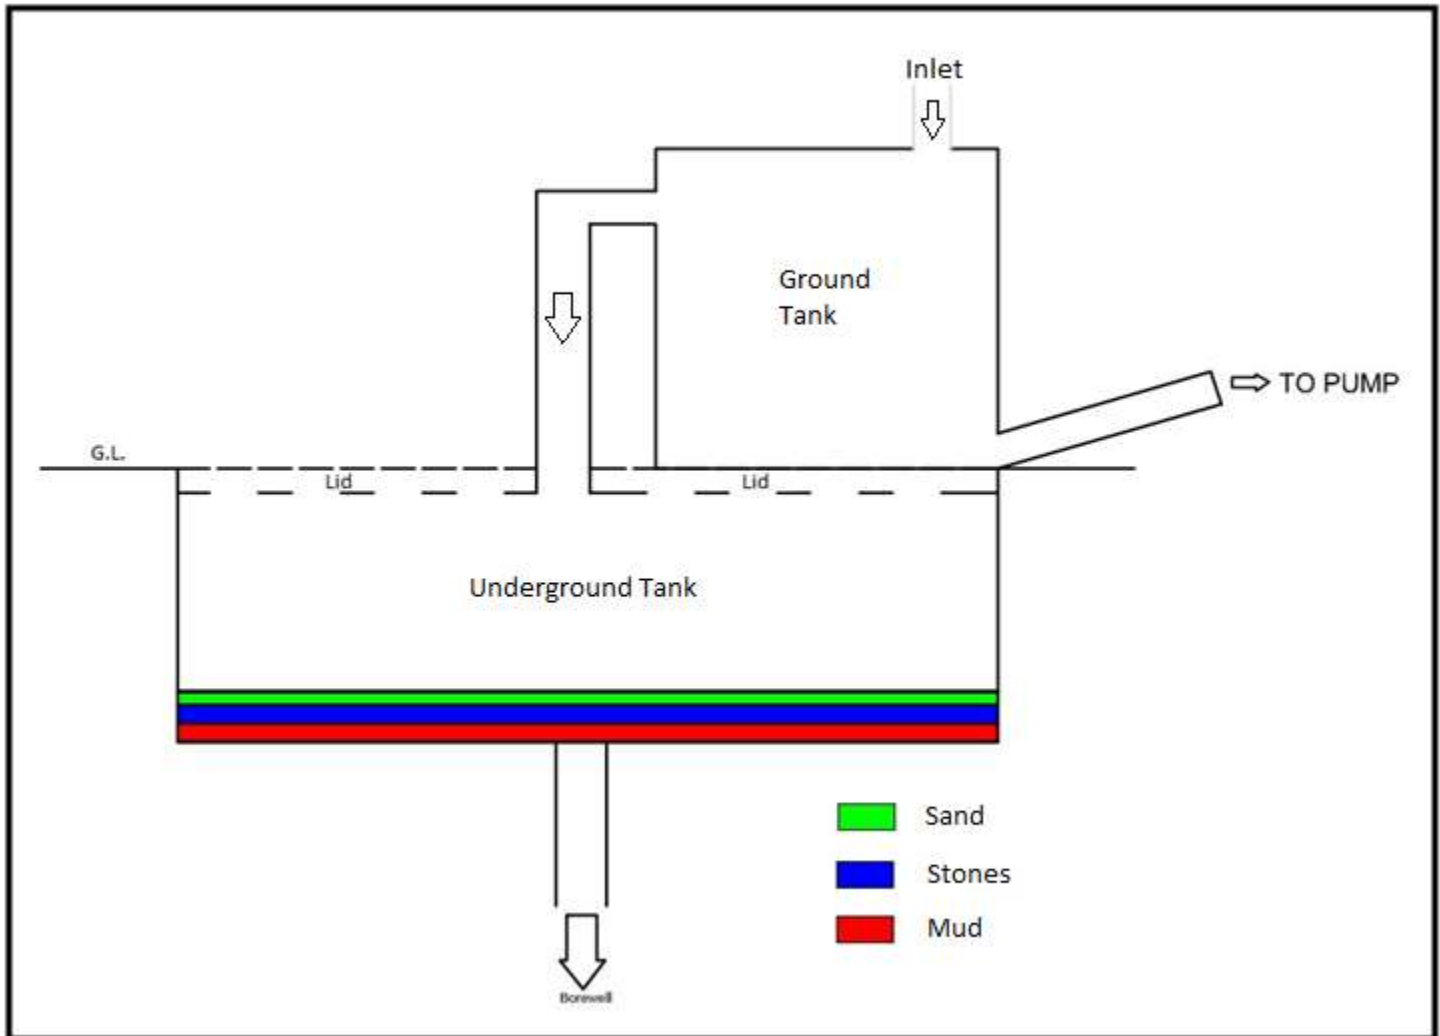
Typical layout of the underground water tank for RH (combined pumping and boring method)
